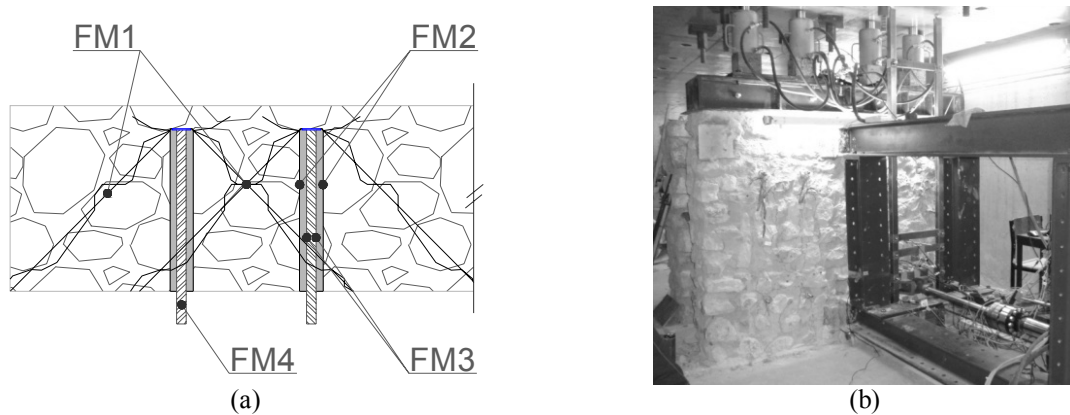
Set-up design: (a) Main failure modes expected; (b) specimen configuration
